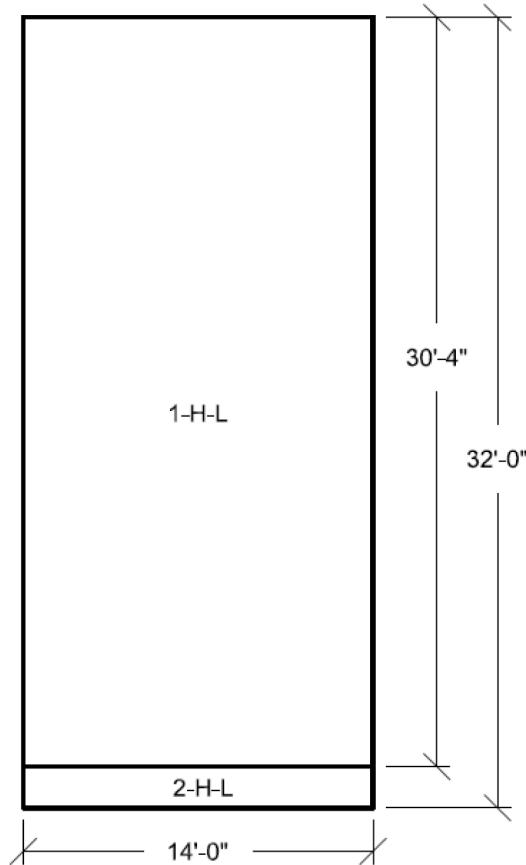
H.6-154B DGFO SV Slab 3 Looking Down
